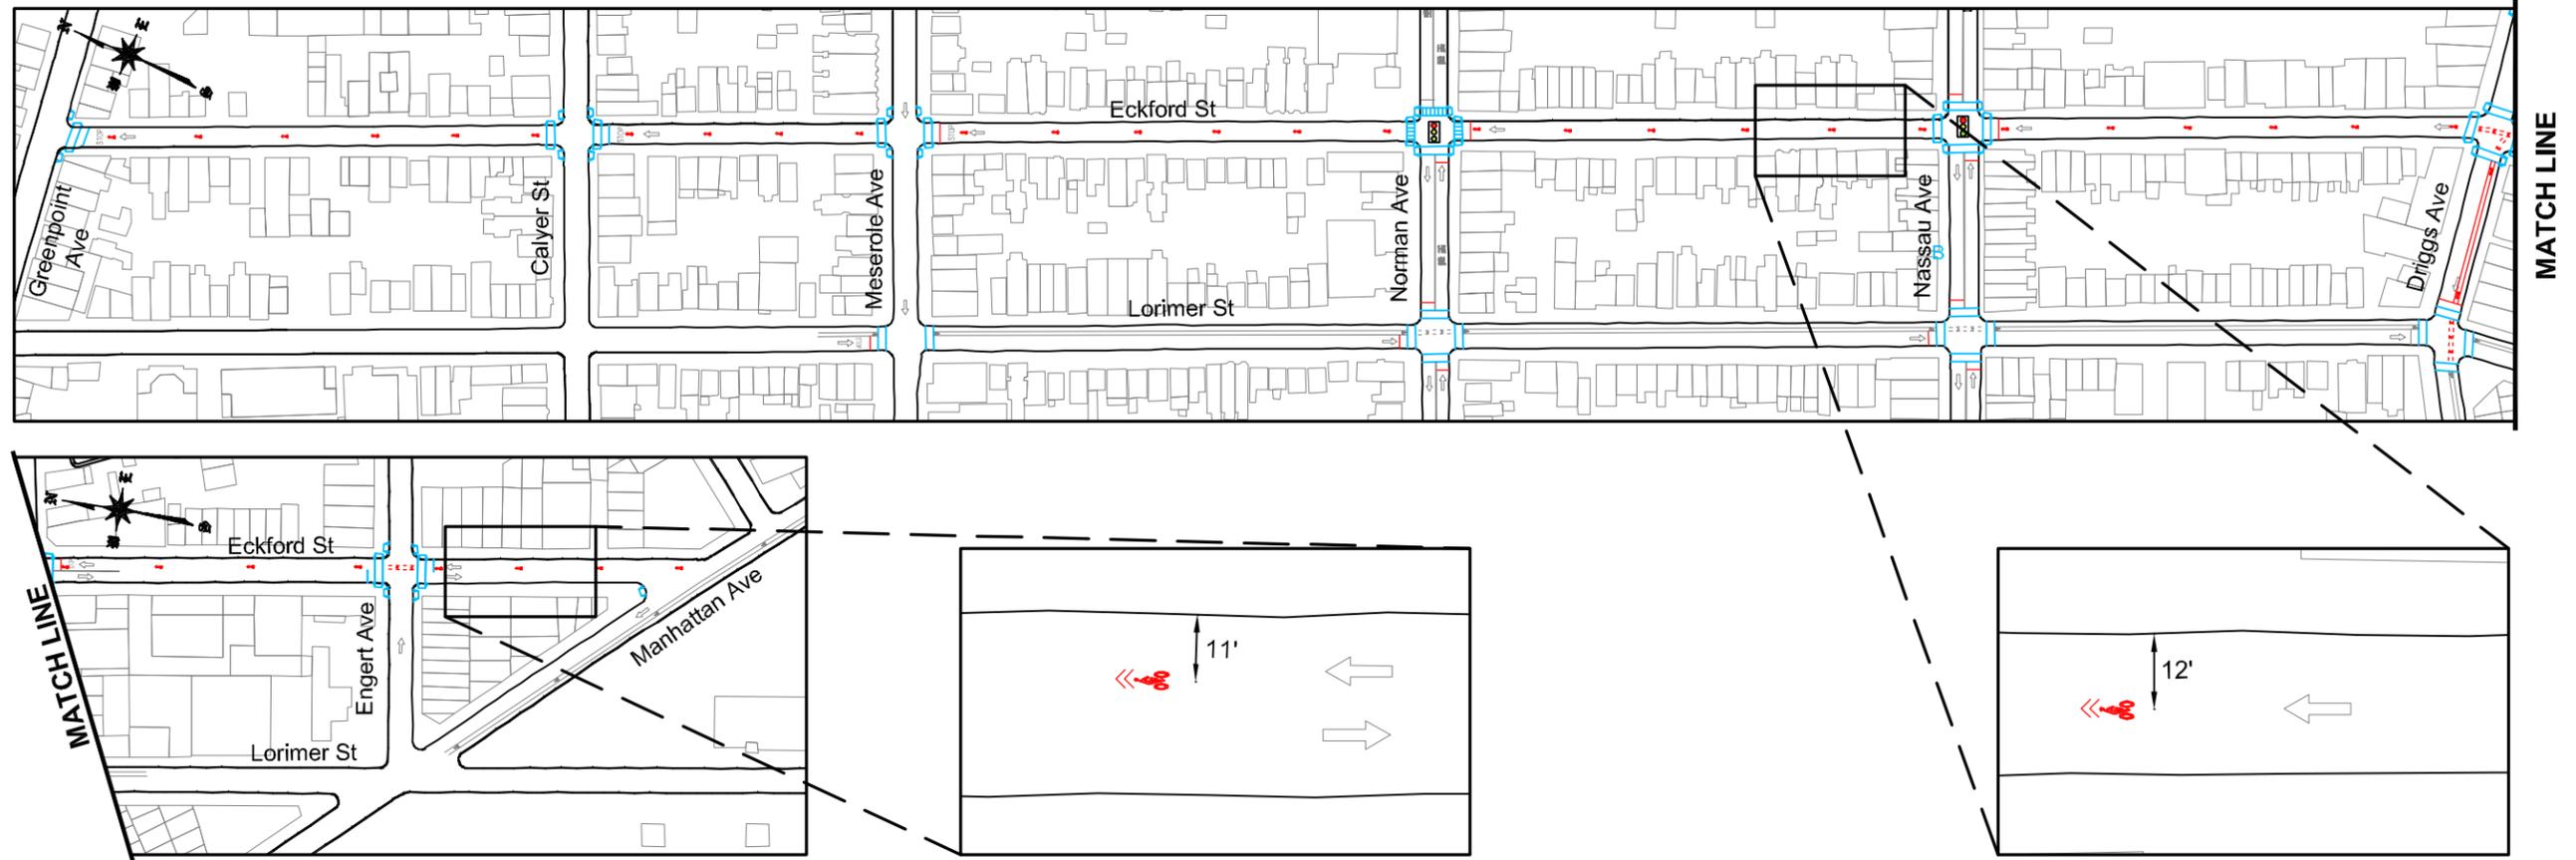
Eckford Street (From Greenpoint Avenue to Manhattan Avenue)
